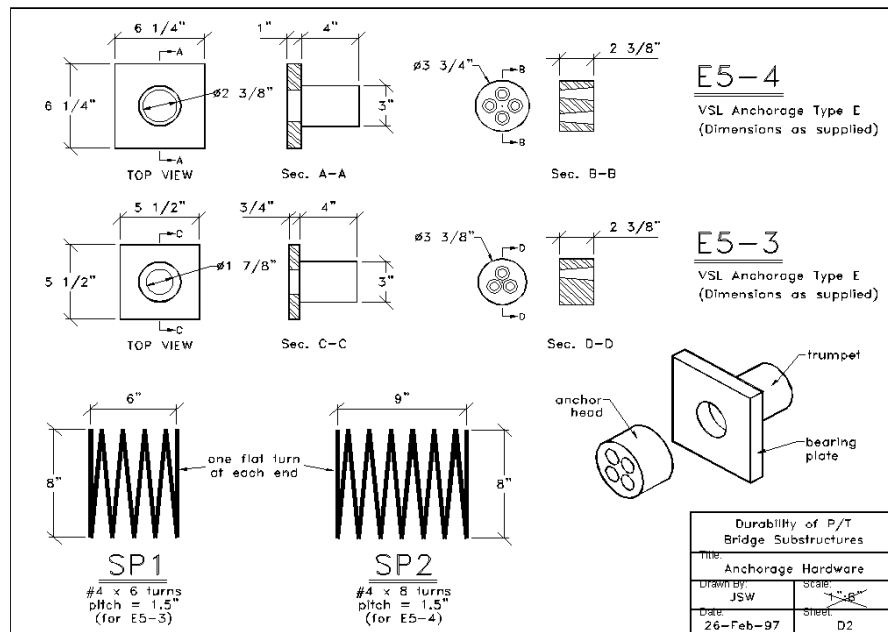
Sheet D2: Anchorage Hardware 4.2
